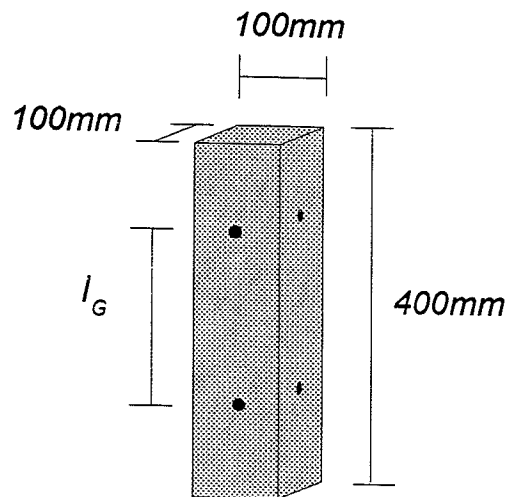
DEMEC: measuring points and dimensions of the test specimens.
